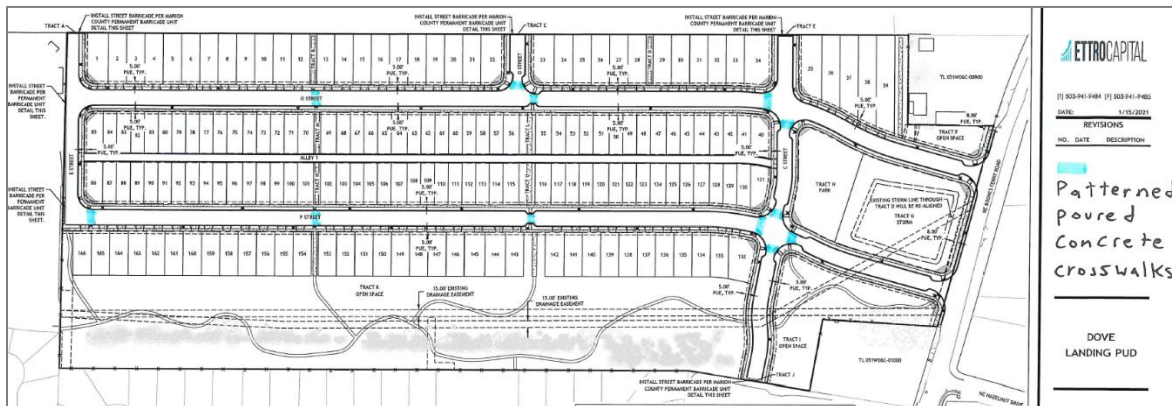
Patterned Poured Concrete Crosswalks (symbolized in blue)
